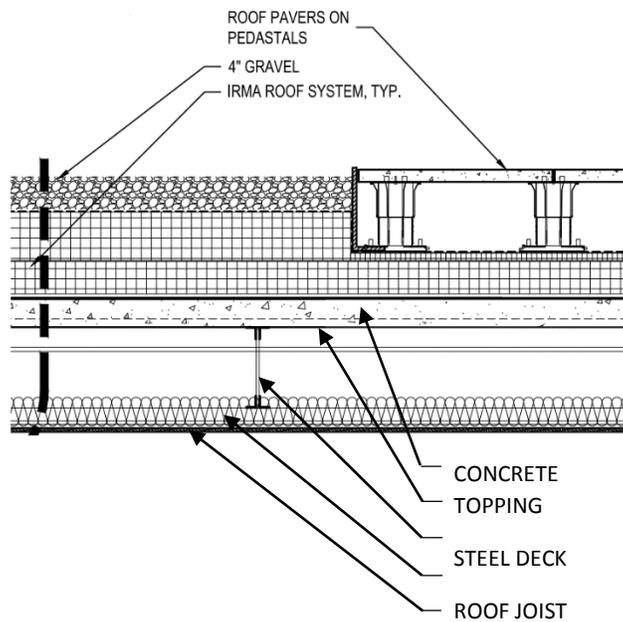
Section through roof at the 12th floor terrace level. From 3/A4.09.
